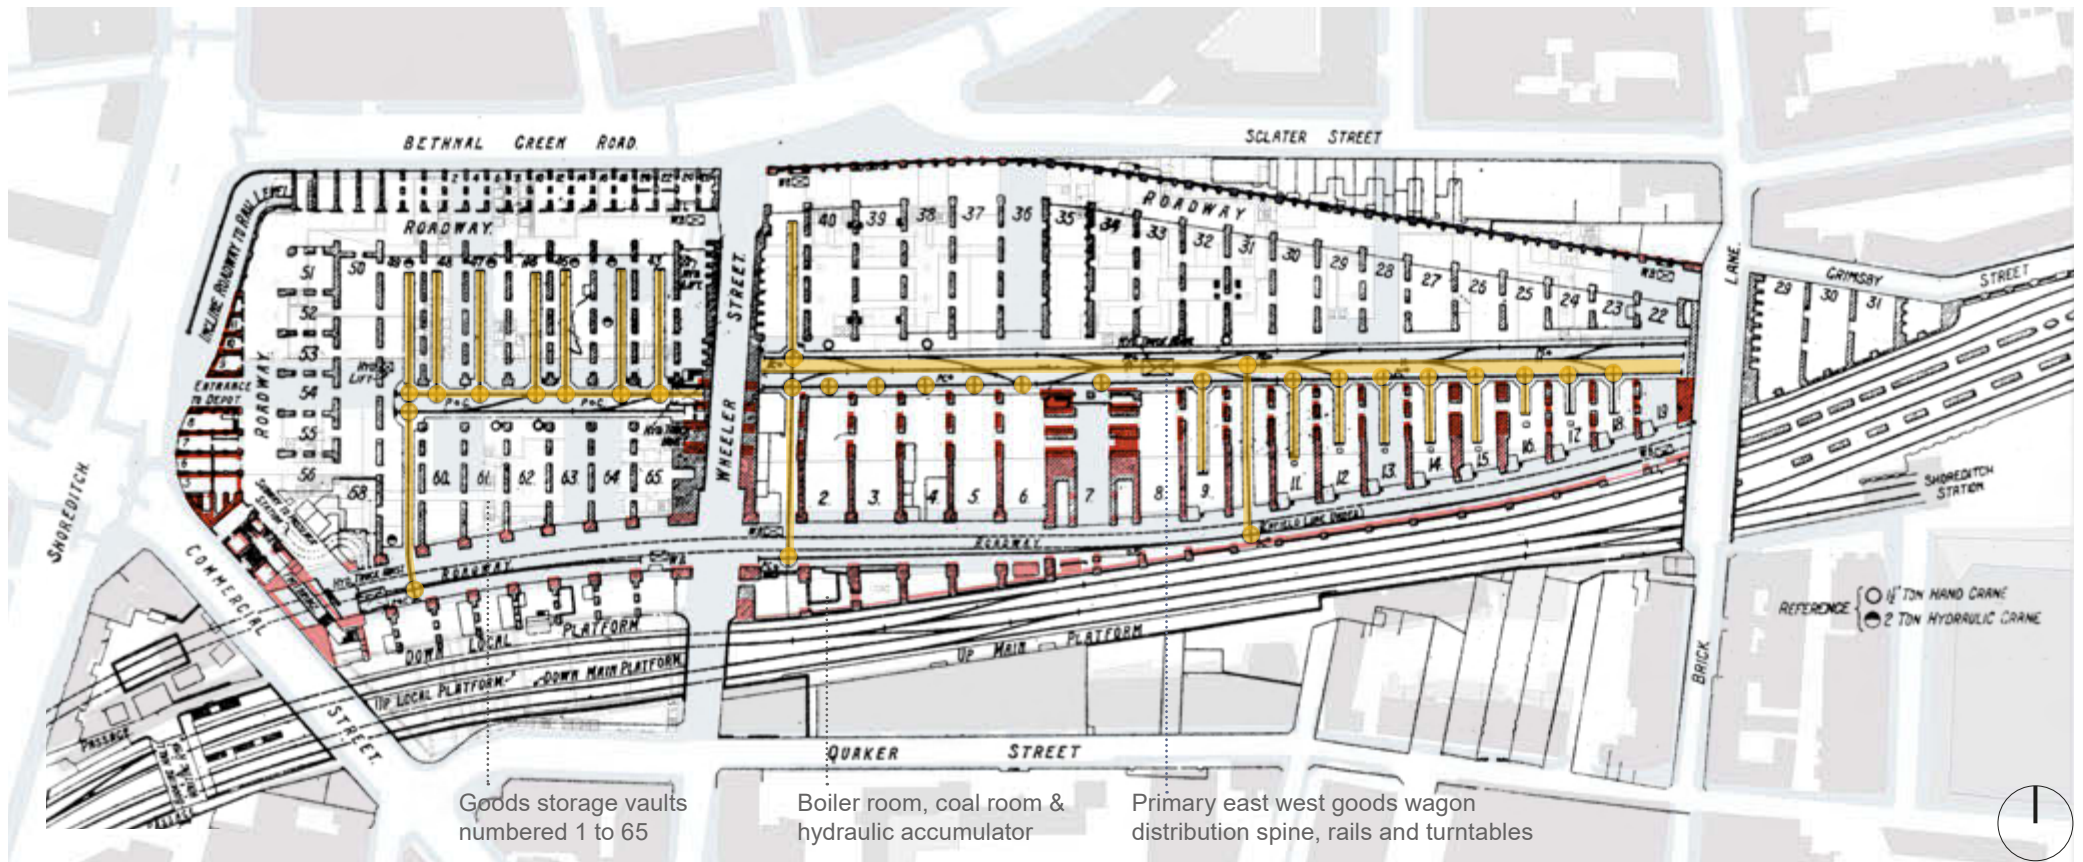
Historic plan: 1890s - Ground level Bishopsgate Goods Yard Station layout
